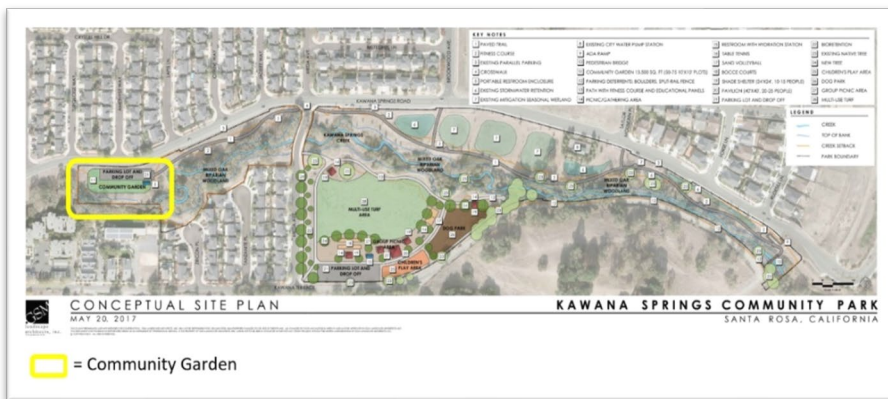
Conceptual Site Plan of Kawana Springs Community Park
